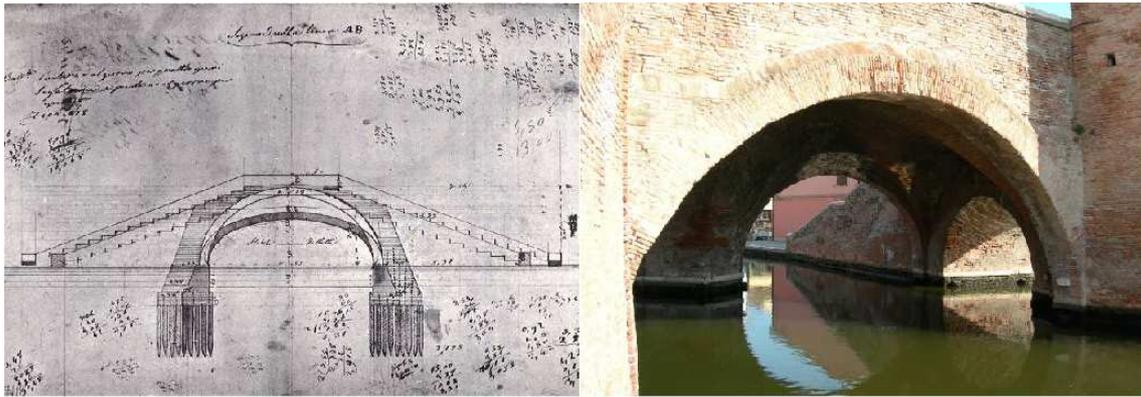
Longitudinal section of Pio V's bridge Figure 6: View of the vault from Pallotta Canal
